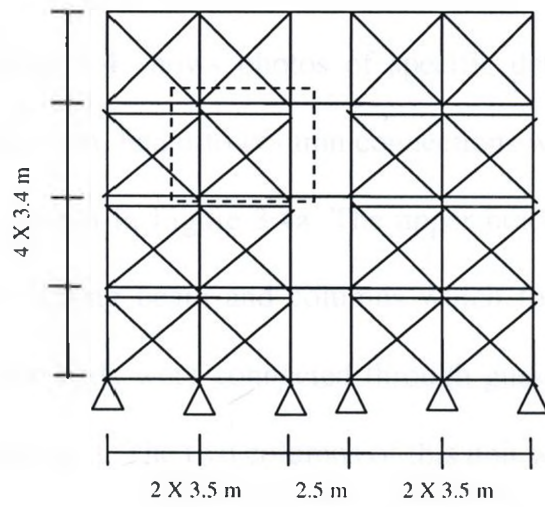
A Typical Plan and Sections of a Modular Steel Building
